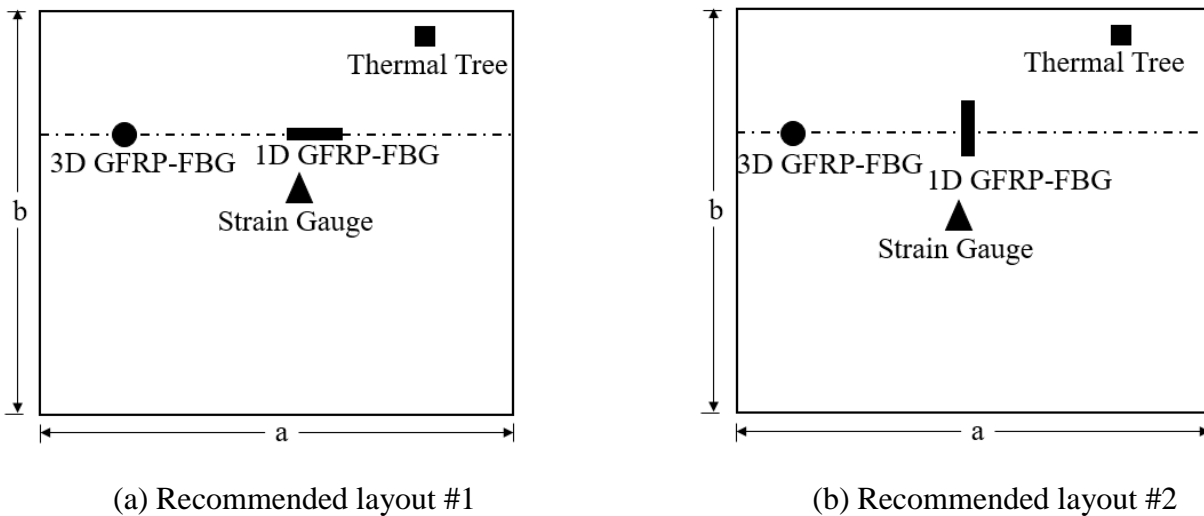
Recommended implementation layouts of the integrated sensing system. (Note: a and b are the length and width of the pavement panel.)
